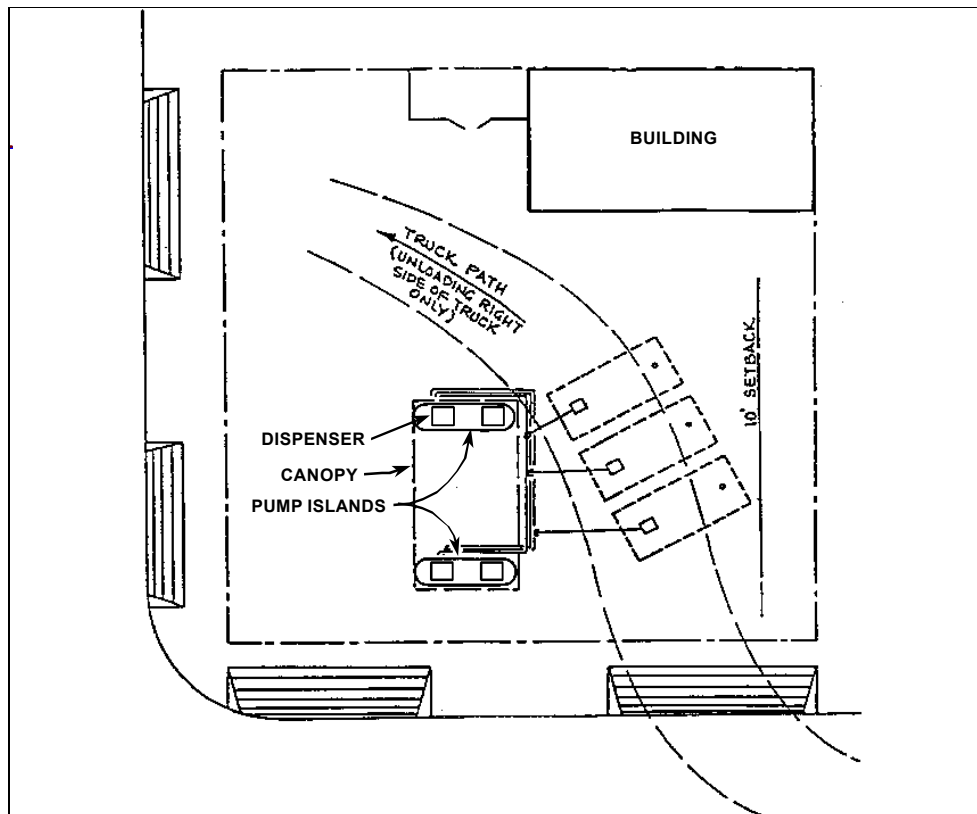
Site plan of a fueling facility (adapted from CEC Manual)
